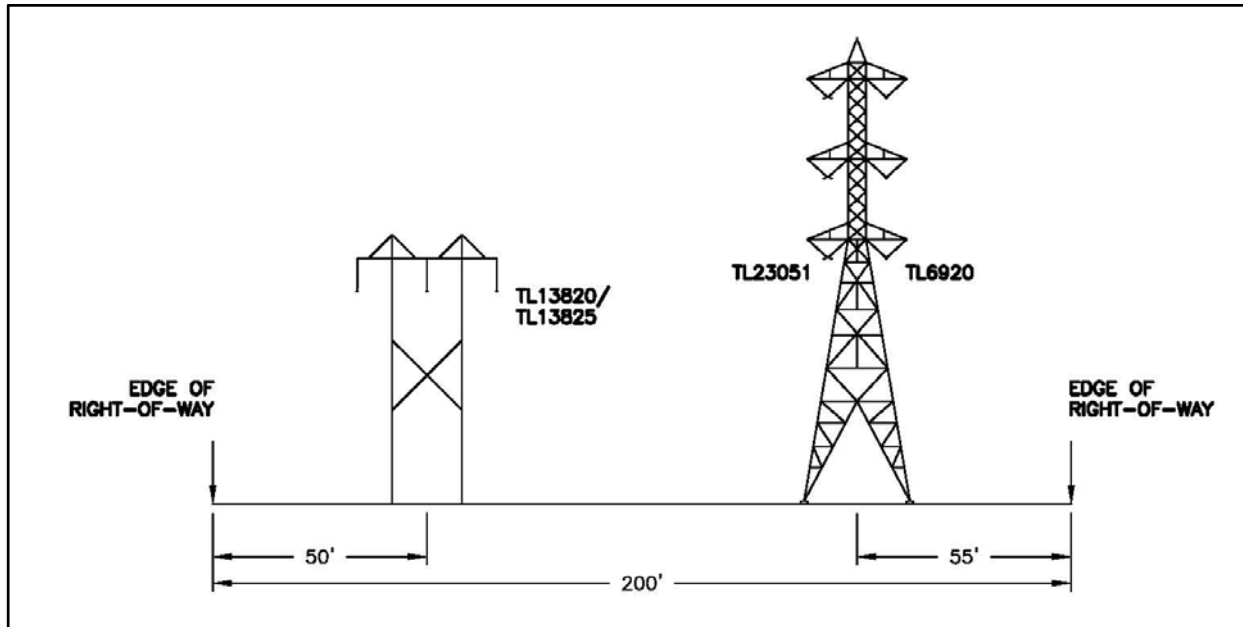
Segment A Existing ROW Cross Section (View North)
